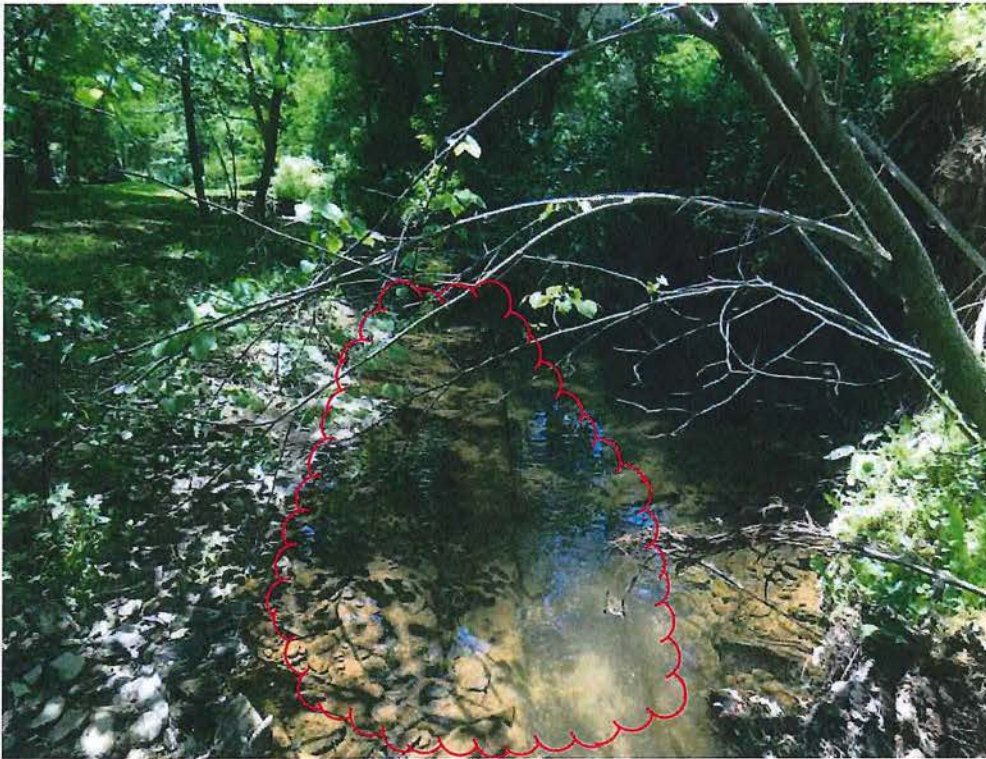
Sewer pipe undermined in streambed leading to manhole in background.
